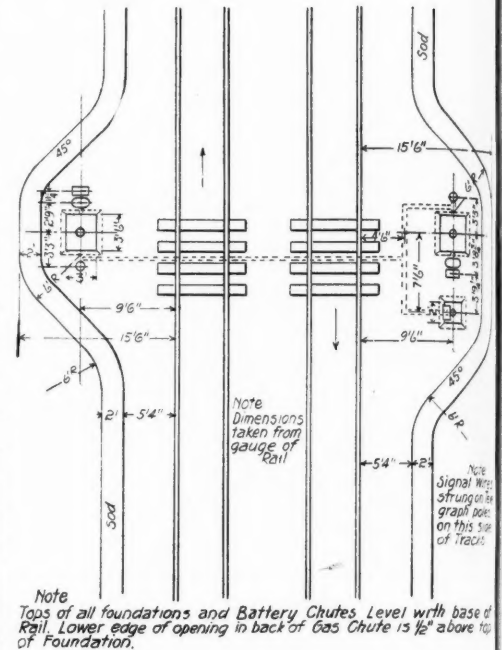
Arrangement of Foundations and Other Apparatus, L. S. & M. S.
